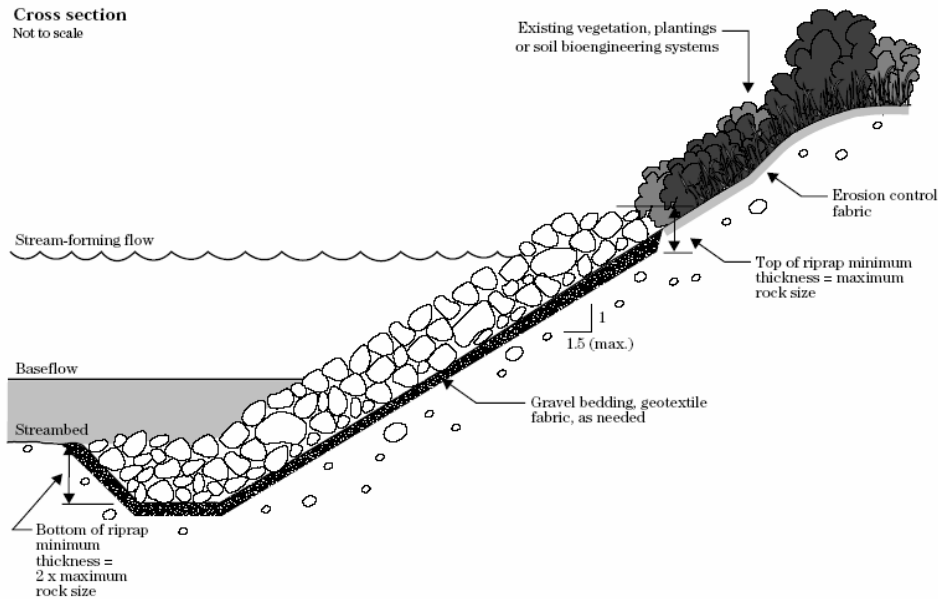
Typical Rock Rip Rap Installation. Source: NRCS Engineering Field Handbook Chapter 16
